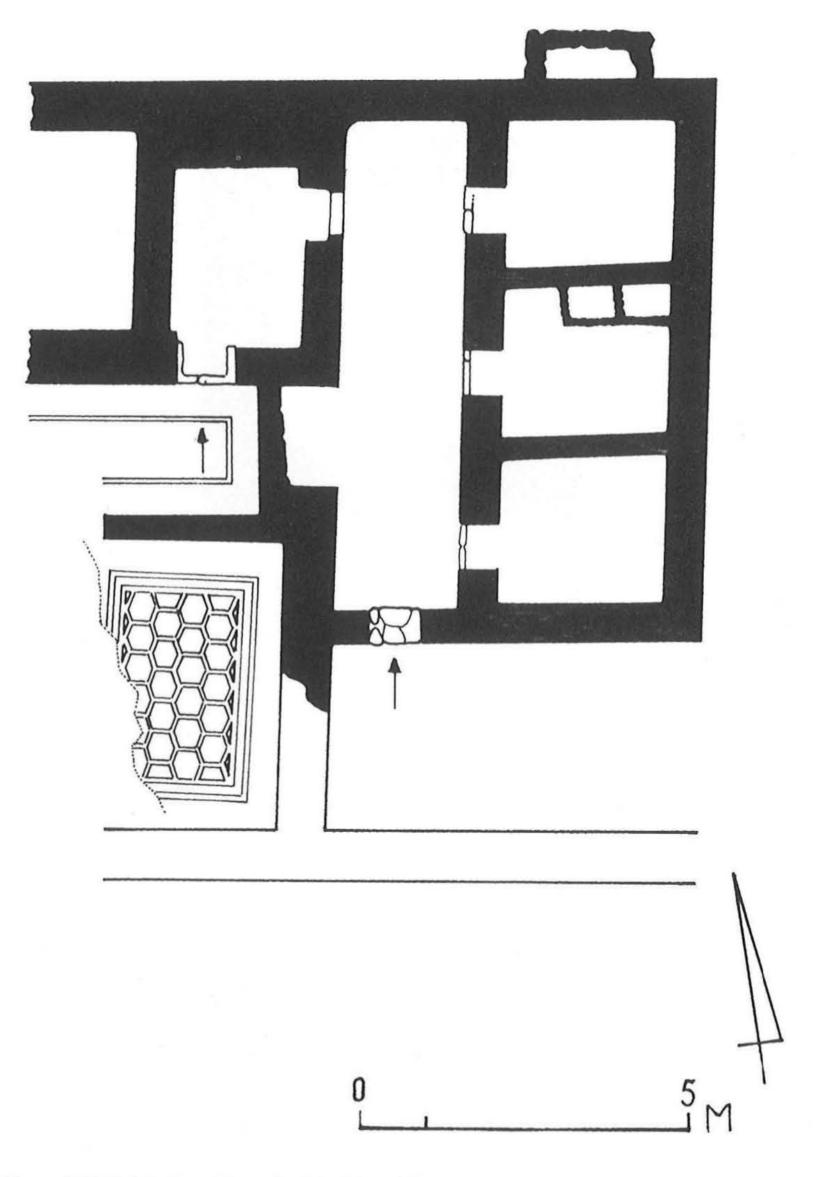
Plan of Cell 1 (after Masada III, Plan 10).
